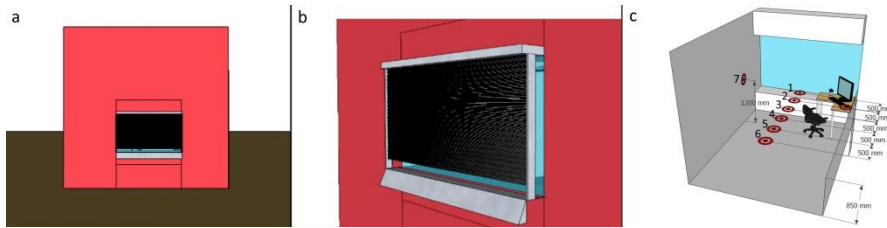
Illustration of the Cube located in Aalborg, Denmark. (a) South façade, (b) external solar shading) and (c) room layout and measurement locations of illuminance.
